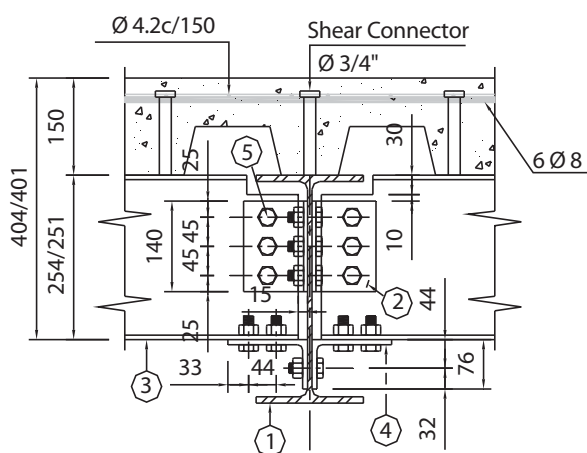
Details of the semi-rigid beam-to-girder connection (dimensions in mm).
